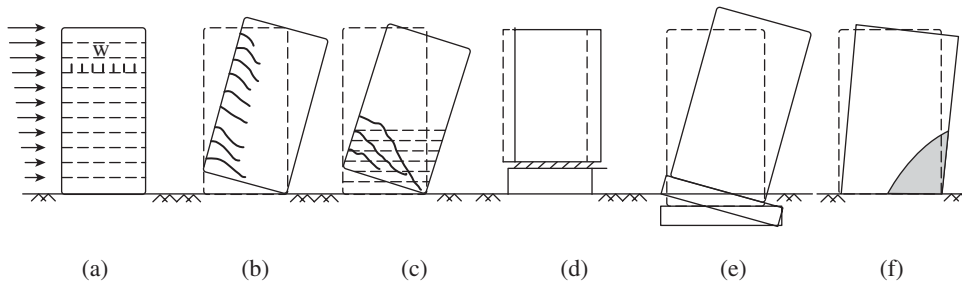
Failure modes in cantilever walls (a) Wall (b) Flexural tension (c) Flexural shear (d) Sliding (e) Overturning (f) Flexural compression
